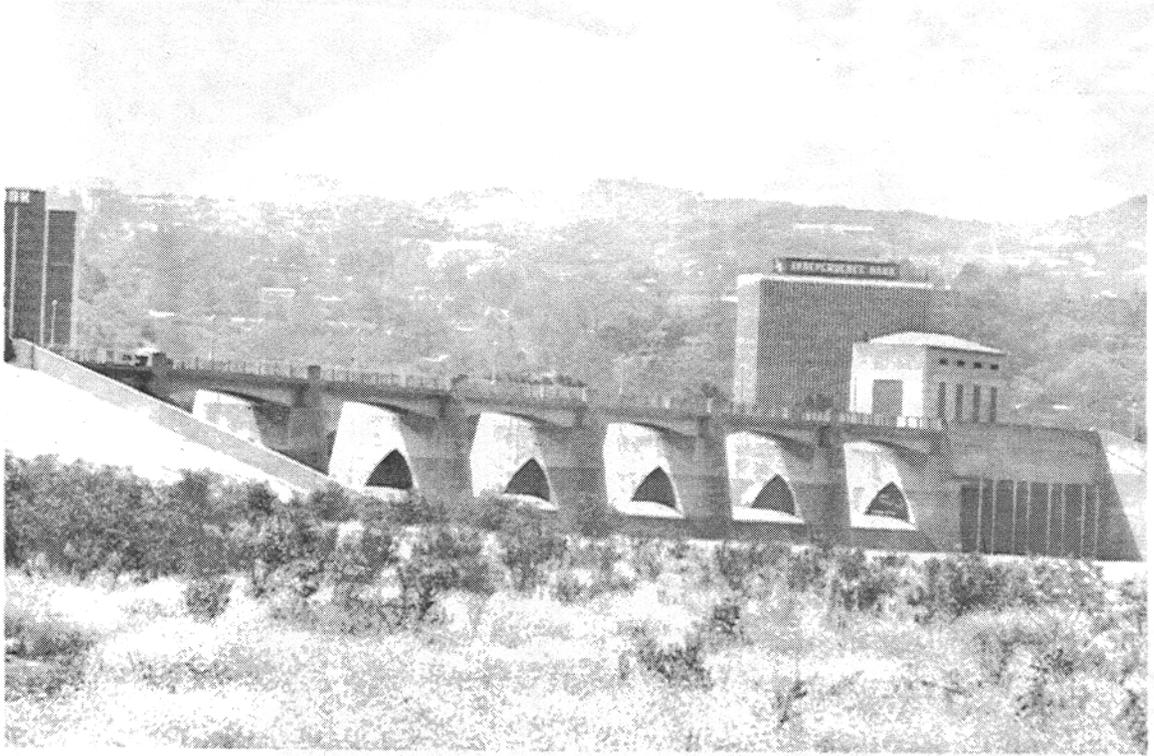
Control House (right) and Spillway (view from upstream, with reservoir.)
